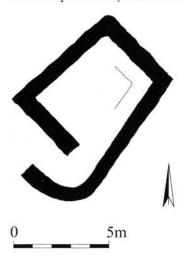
Site WHKRS 59. Sketch plan of the redoubt.
